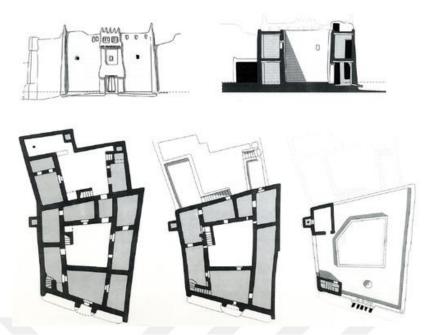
Typical Plans, Elevation and Section of a Tukulor House in Djenne (Chabbi-Chemrouk, 2004, p.16).
